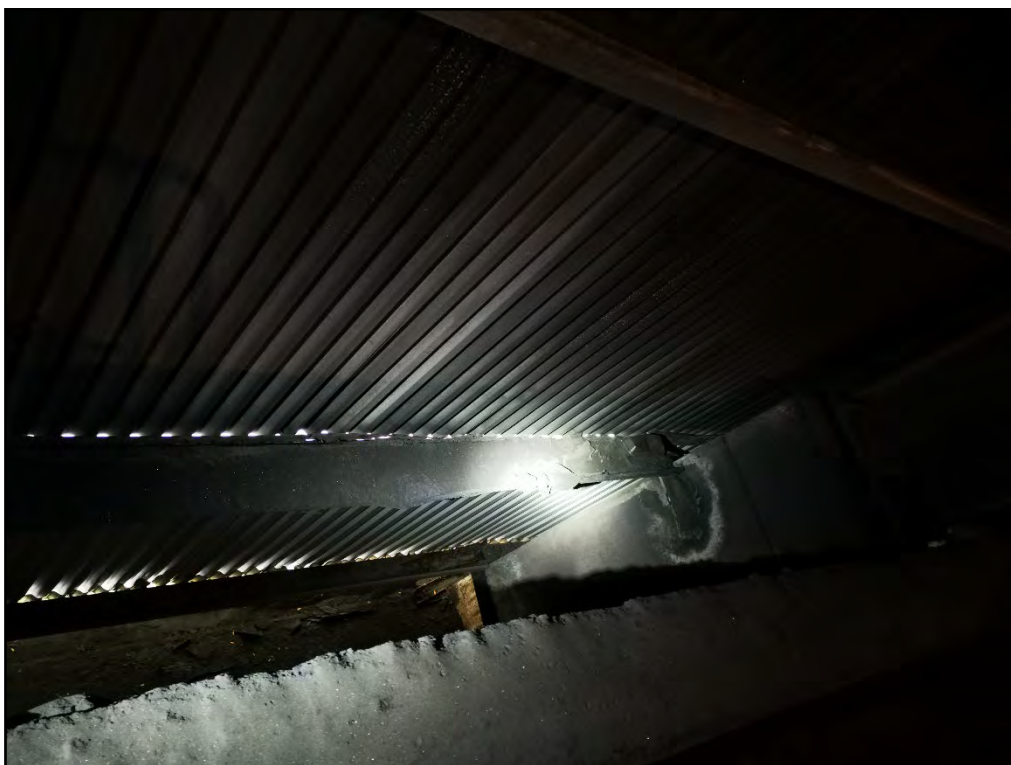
Surface Corrosion of Purlins and Roof Sheeting
